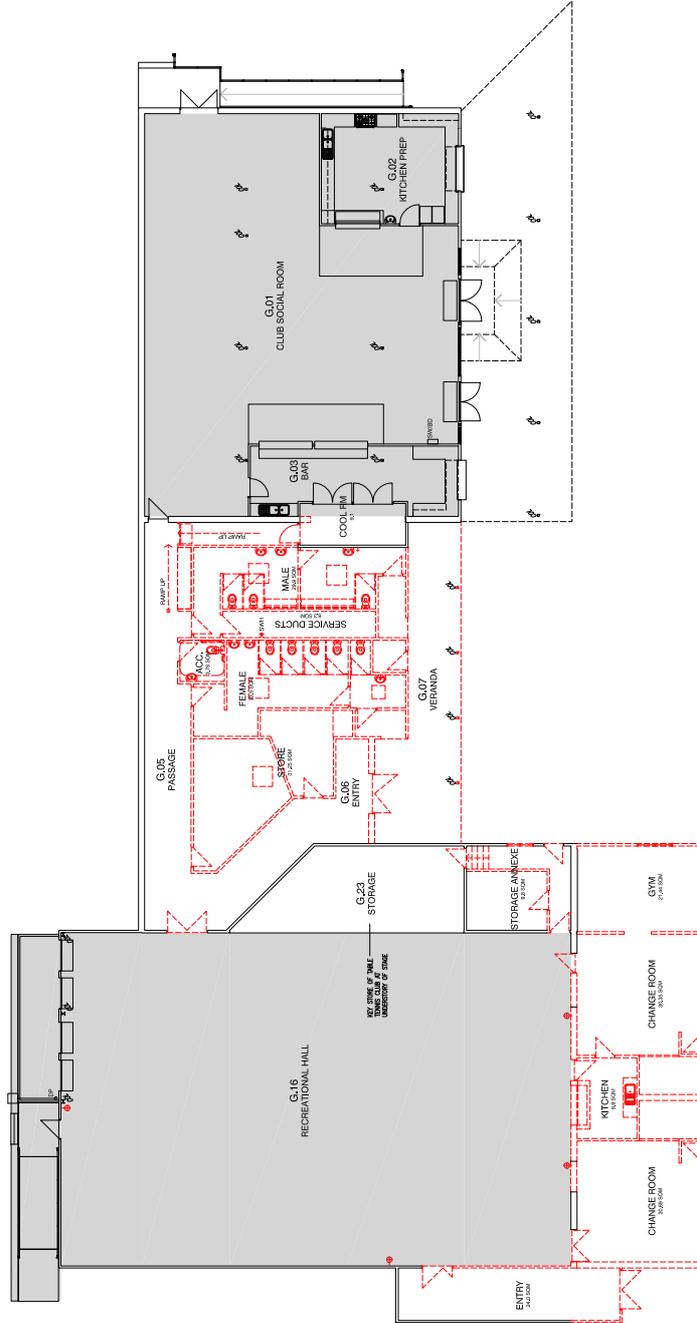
and 22 show a potential plan for the upgrade and expansion of the Memorial Reserve Hall, the change rooms, and the social room. Building plans will be subject to further review and development when design development is funded. The current building concept plan features the following key improvement projects:
